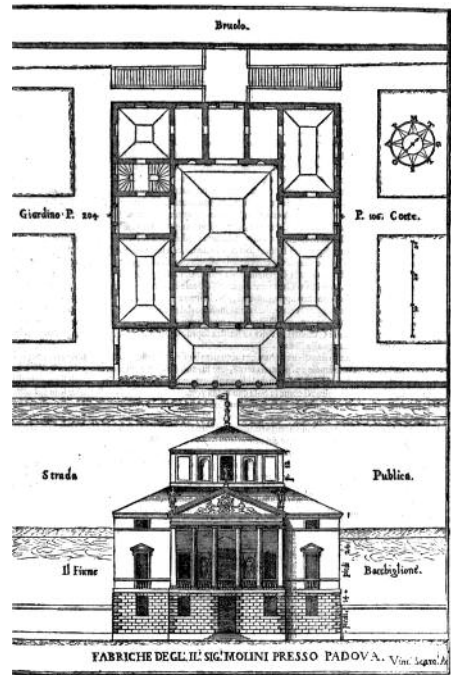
Vincenzo Scamozzi, Villa Molini, plan and elevation, *L'idea della architettura universal*, 1615.
